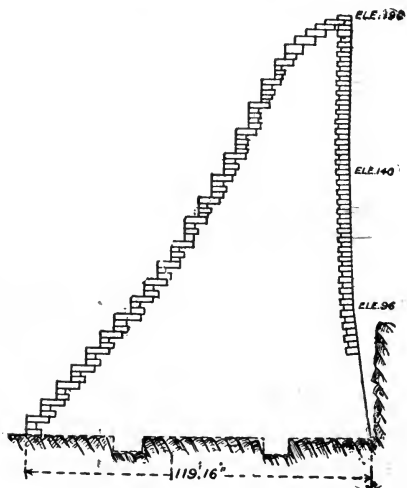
CROSS-SECTION OF OVERFALL WEIR. NEW CROTON DAM, CORNELL'S.
